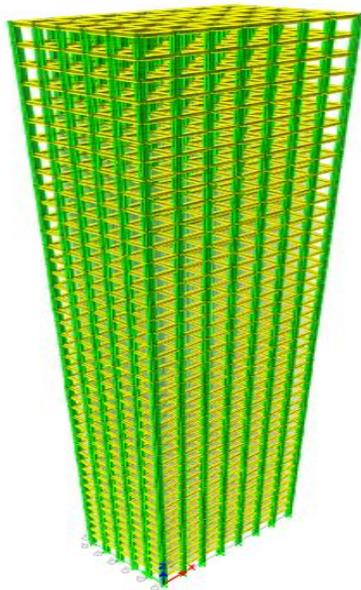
Perspective View Of A Storey At Outrigger Location Madel 2 (With X Outriggers)
